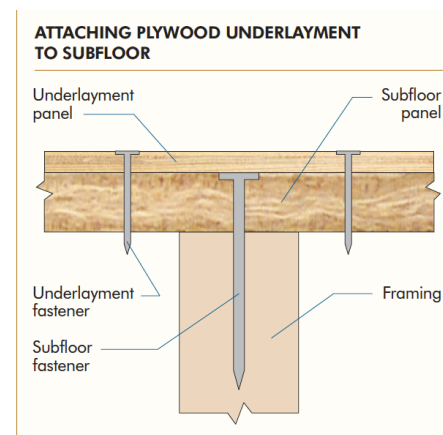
Attaching Plywood Underlayment to Subfloor. (The Engineered Wood Association, 2013).
